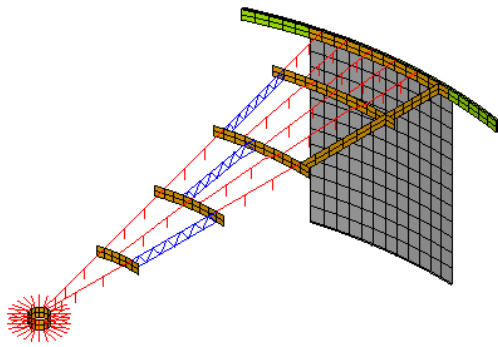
Elemental configuration of the intermediate stiffeners of the roof (red: trusses, blue: rafters, brown: bulkheads)
